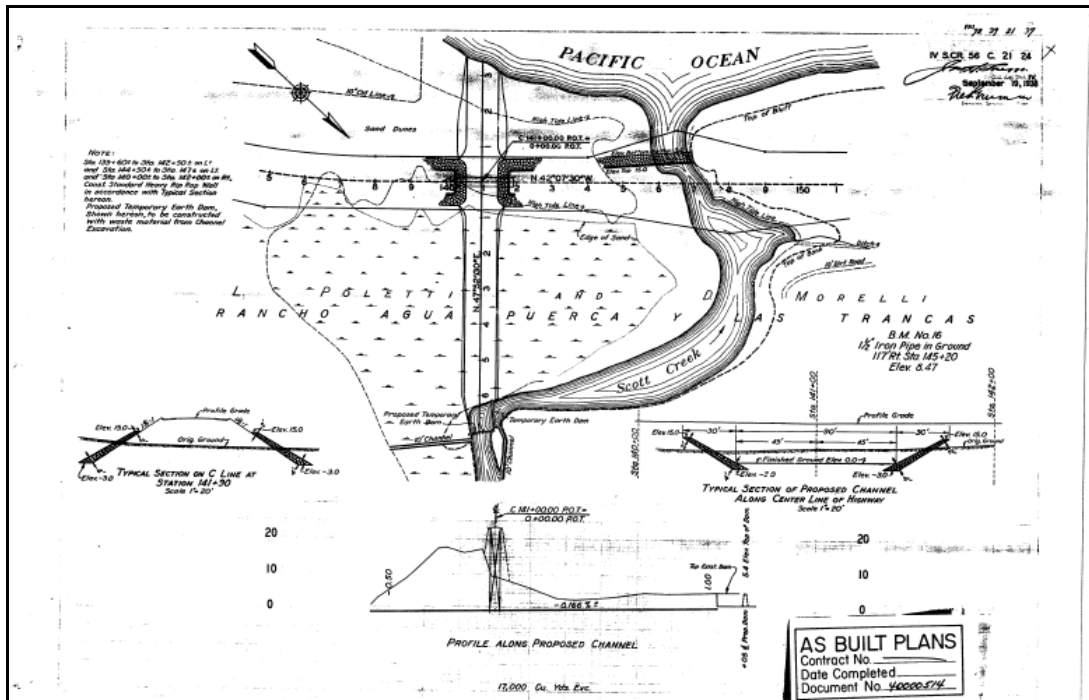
As built plans for Highway 1 Bridge on Scott Creek, Santa Cruz County.
